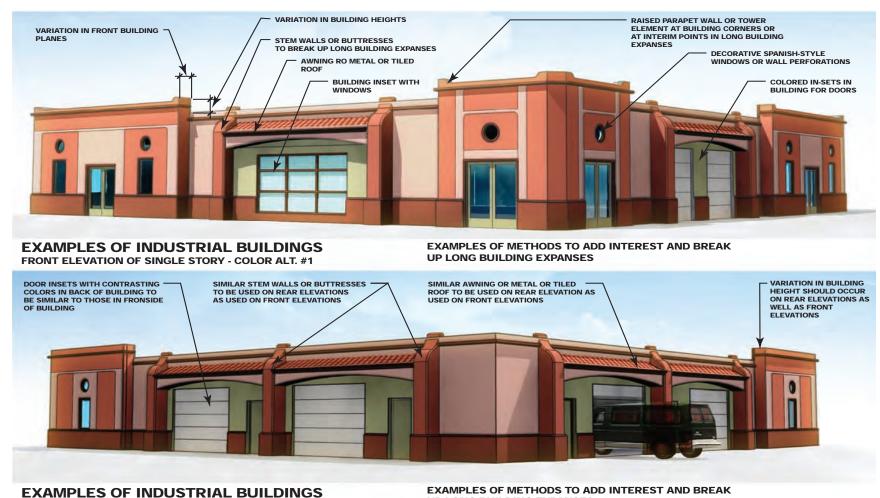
| Examples of Industrial Buildings - 1 Story Alt.1 Single Story - Color Alt. #1
